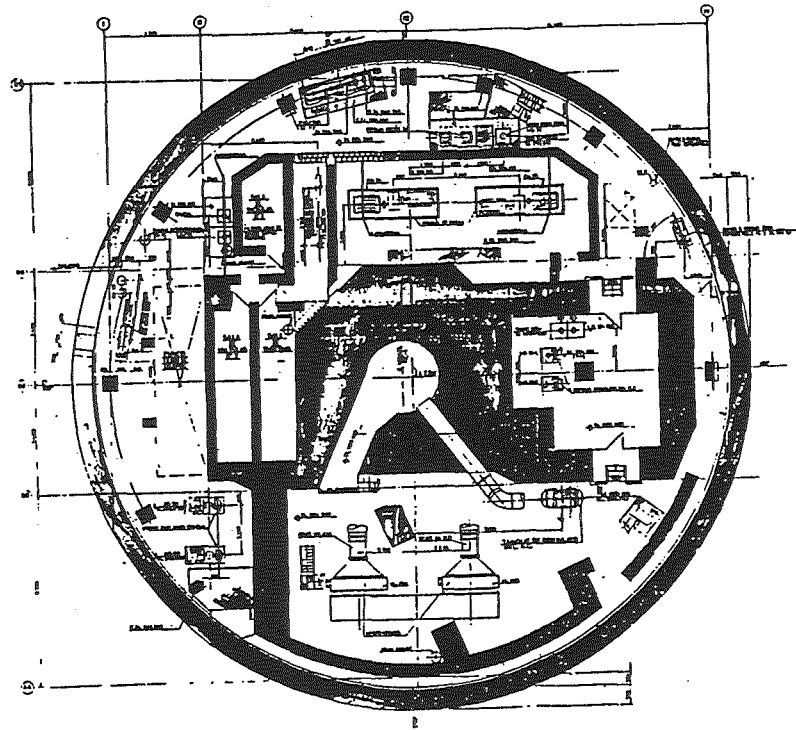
C.N. "José Cabrera". Drawing of the lower part of reactor containment building.
